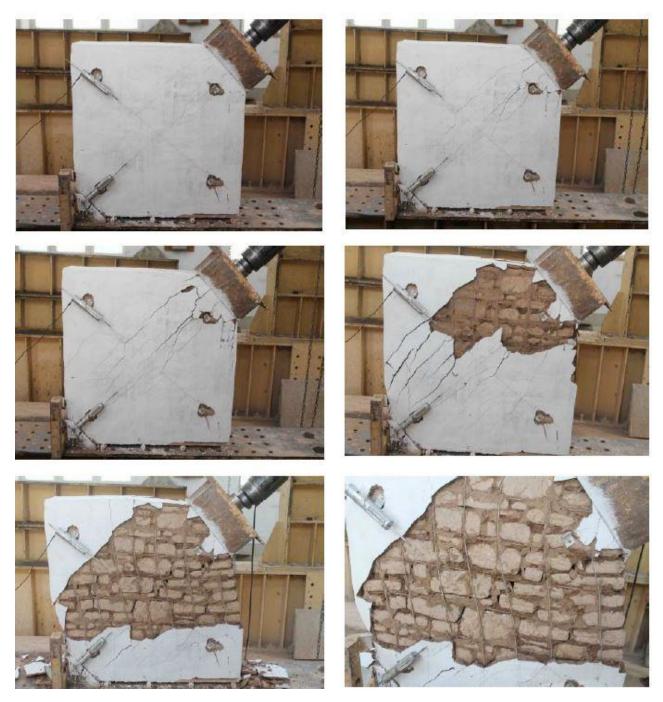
Damage evolution of the stone masonry wall in unstabilized mud mortar under diagonal tension test – with containment
